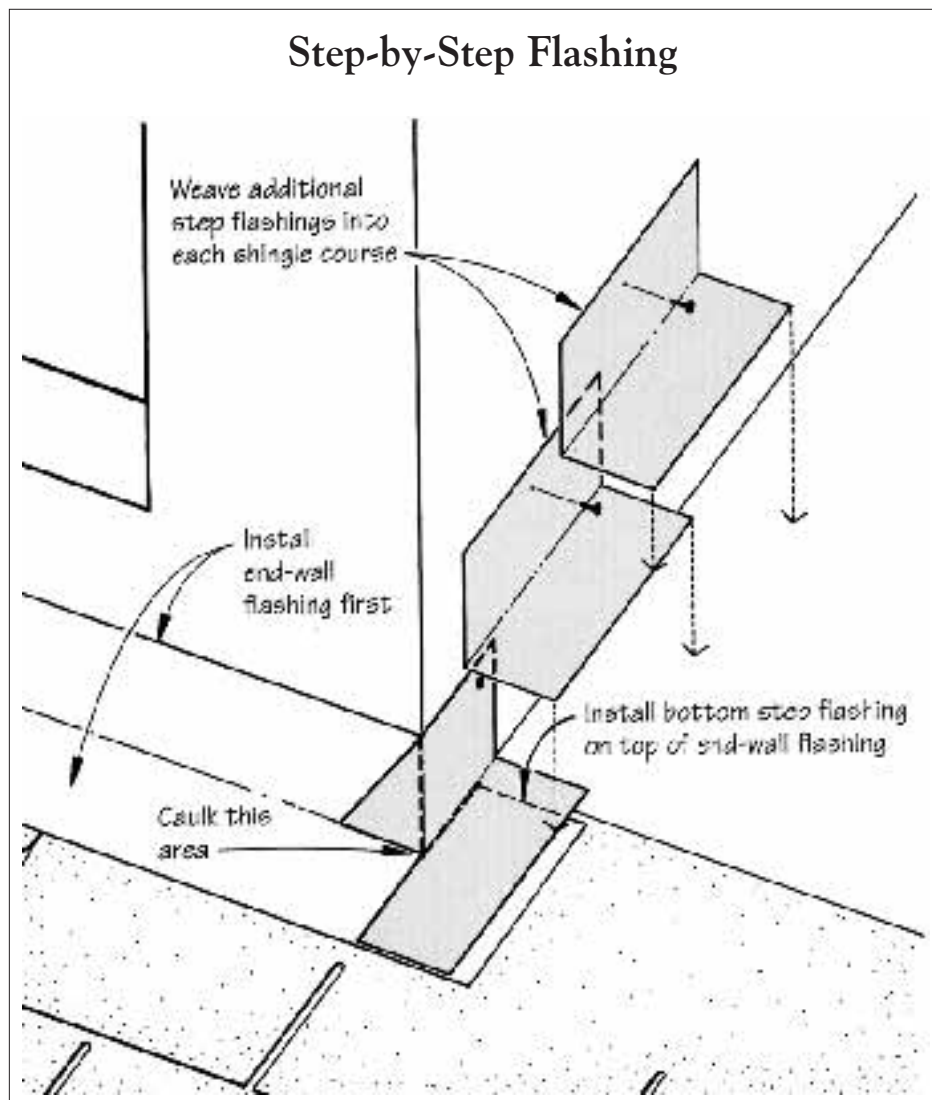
When flashing a dormer, install the end-wall flashing first, then work up the roof with step flashing at each shingle course. Attach each step flashing with one nail in the dormer wall sheathing.
